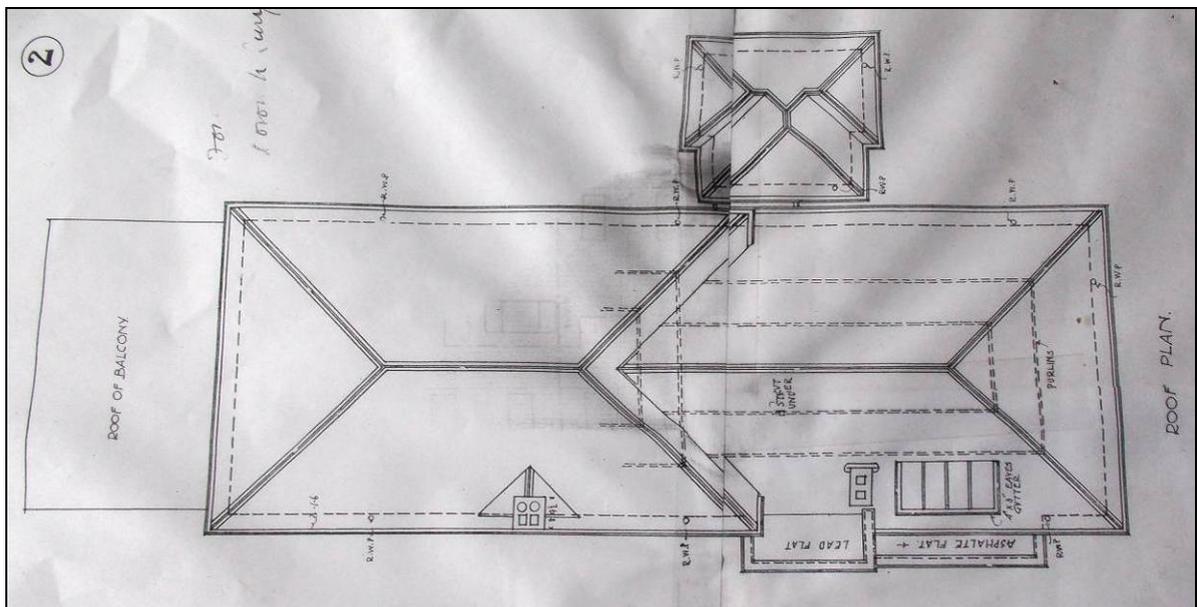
Copy of original architectural drawing of Building 41 showing the roof plan.
